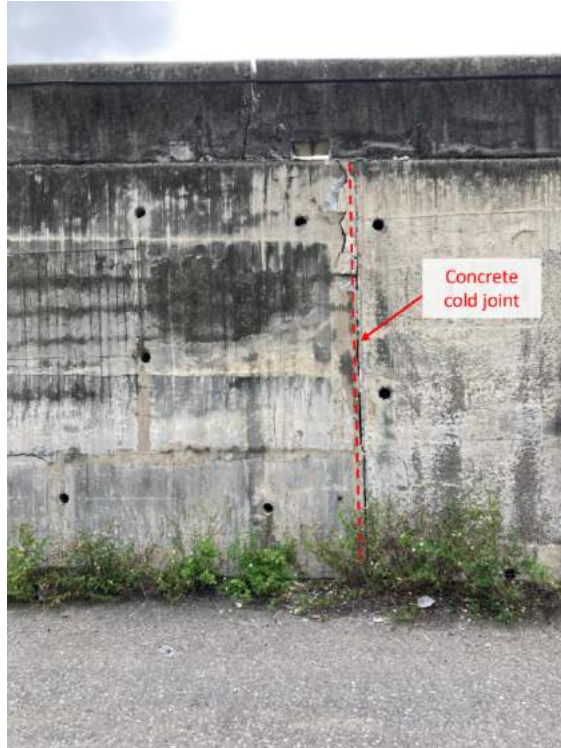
Typical cold joint in the cast-in-place concrete wall retaining the soil of the approach berms (23.26636° 121.29767°)
